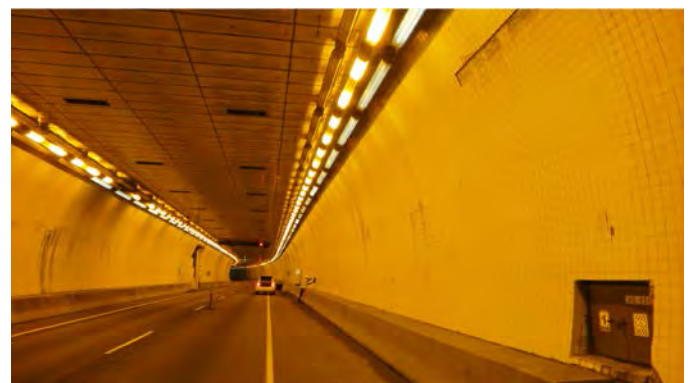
Visual image of the Hanging Lake Tunnel roadway section.
